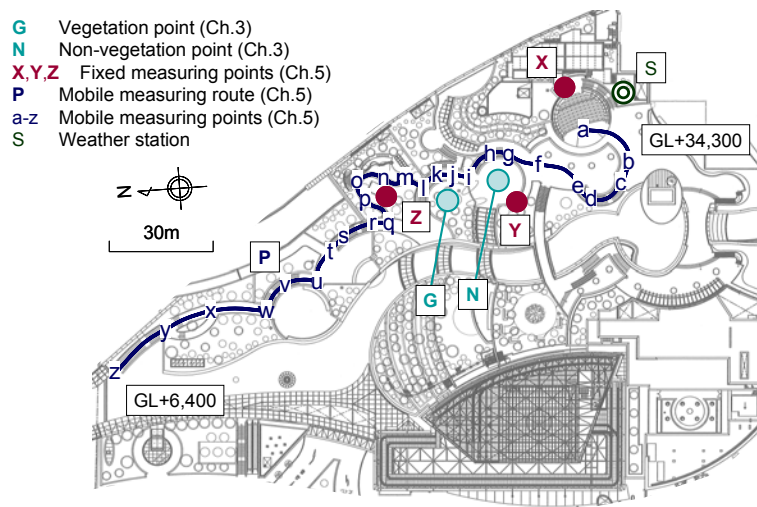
Floor plan of rooftop garden and measuring positions including those mentioned in chapter 5.
